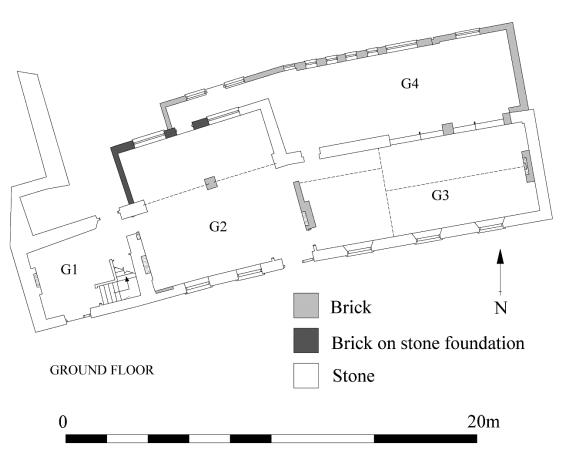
Ground floor plan Modified from plan supplied by ABDS Ltd
